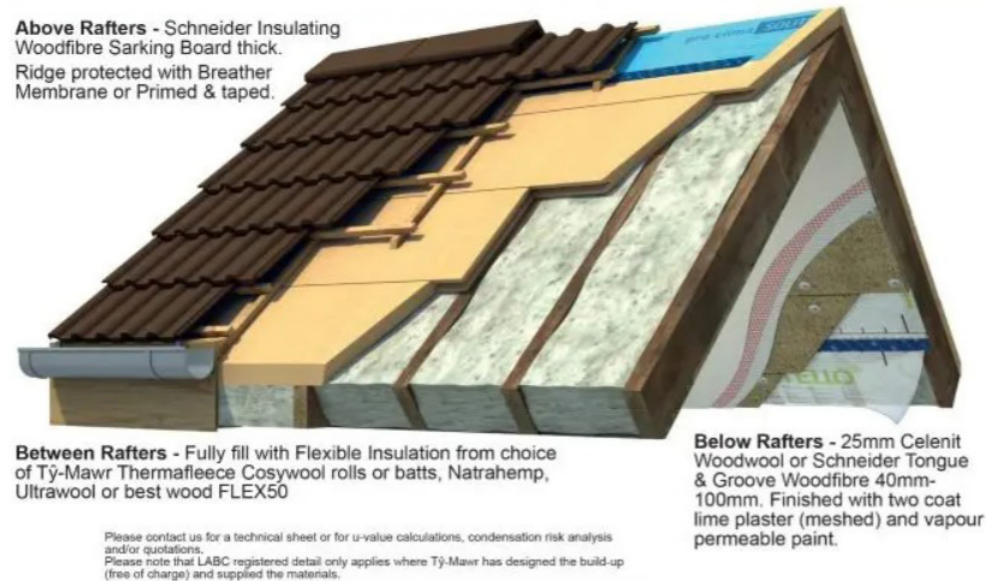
Roof build up sample detail of conservation wood fibre insulation and lime build up to suit listed building structure.
